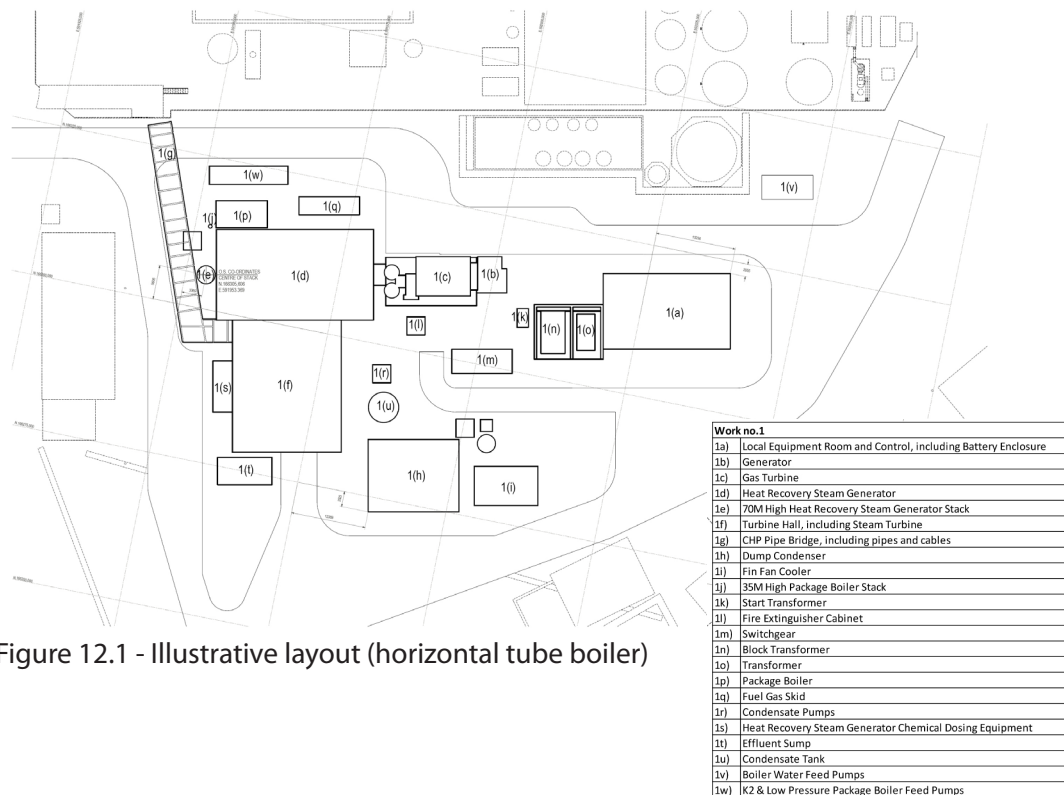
Illustrative layout (horizontal tube boiler)
